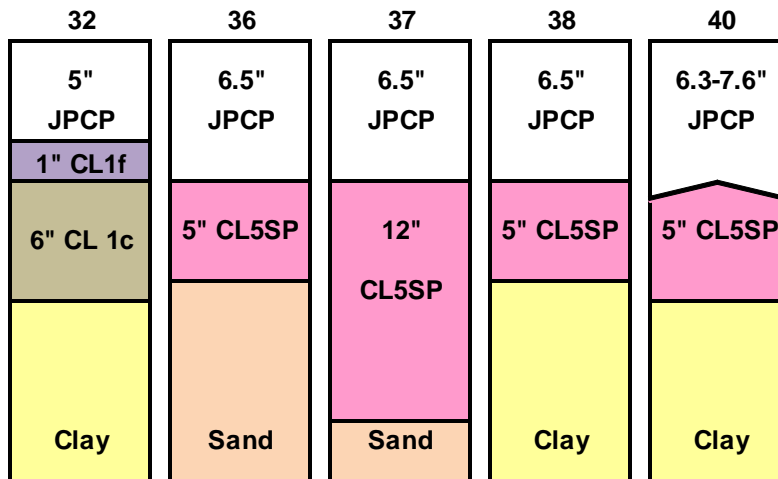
MnROAD Low Volume Road (LVR) test cell design details.
